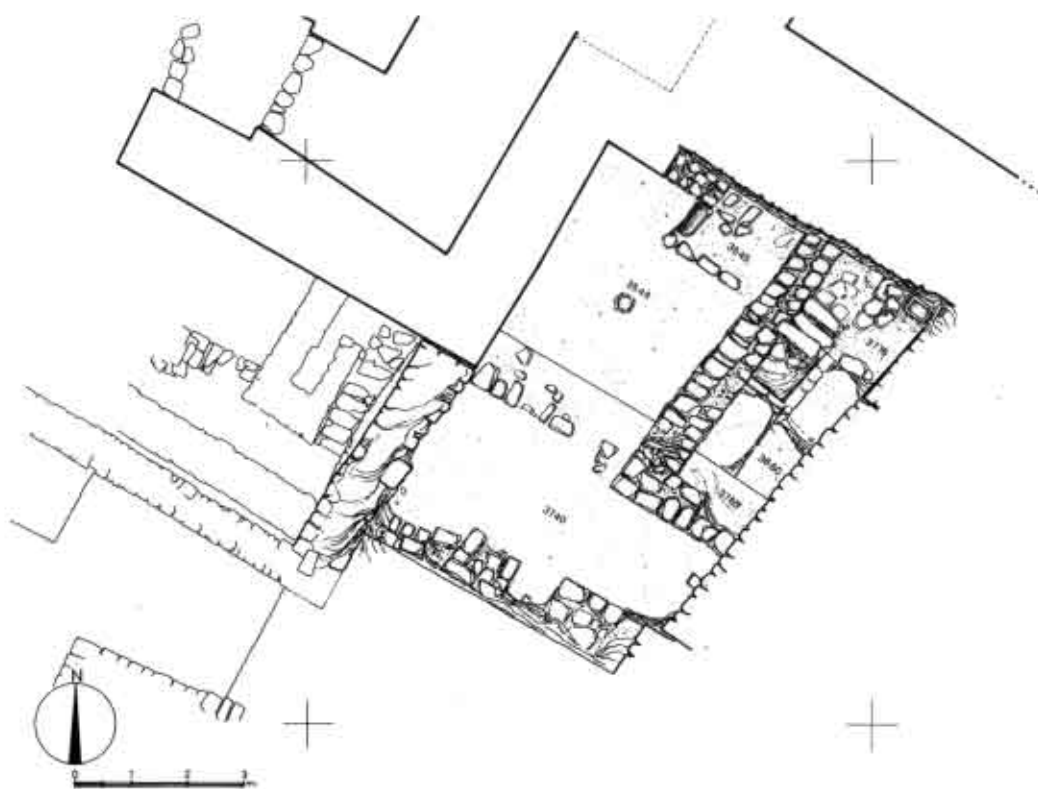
Sumhuran: detailed plan of the Building BA4.
